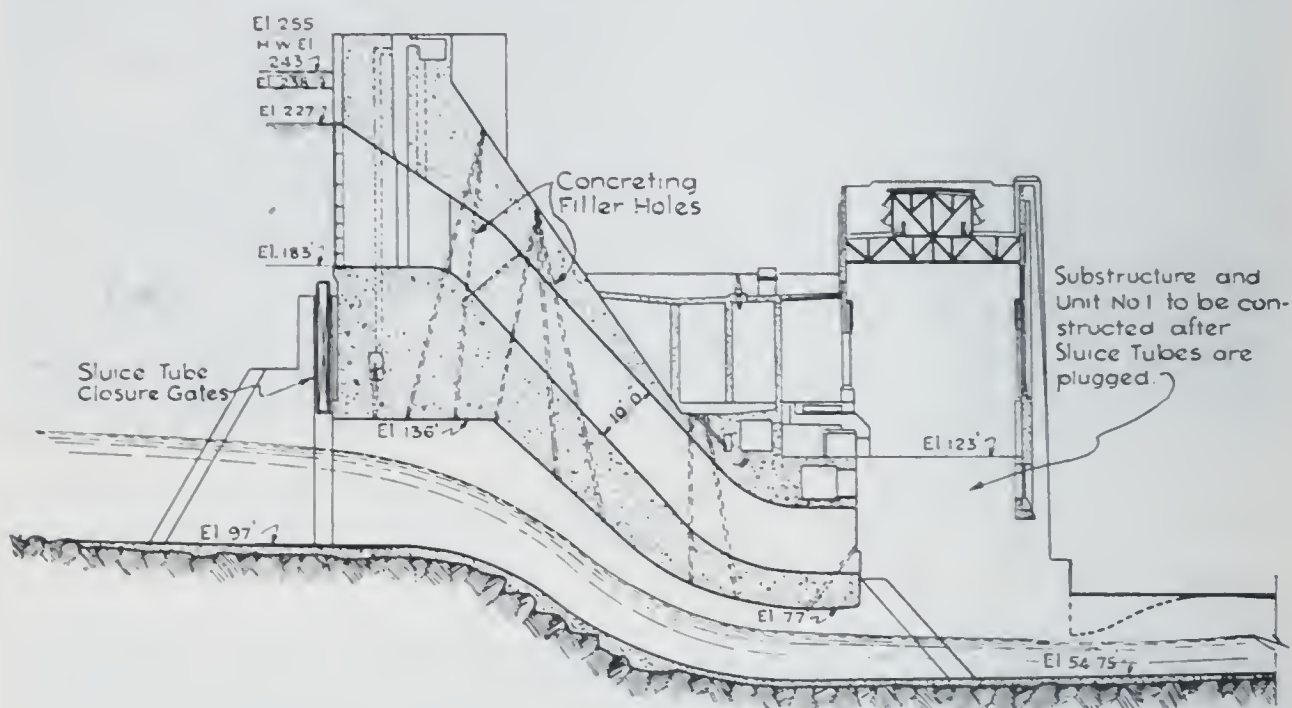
Section through Diversion Sluice Tubes and Power-House at Unit No. 1.
